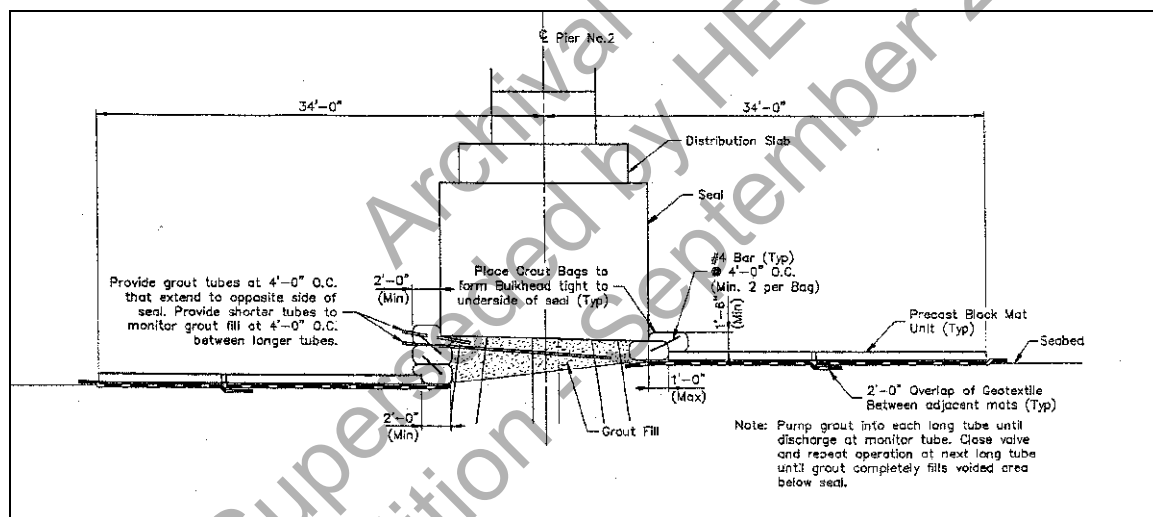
Design plans of cable-tied precast block mat for Tukey's Bridge, ME (MDOT).
